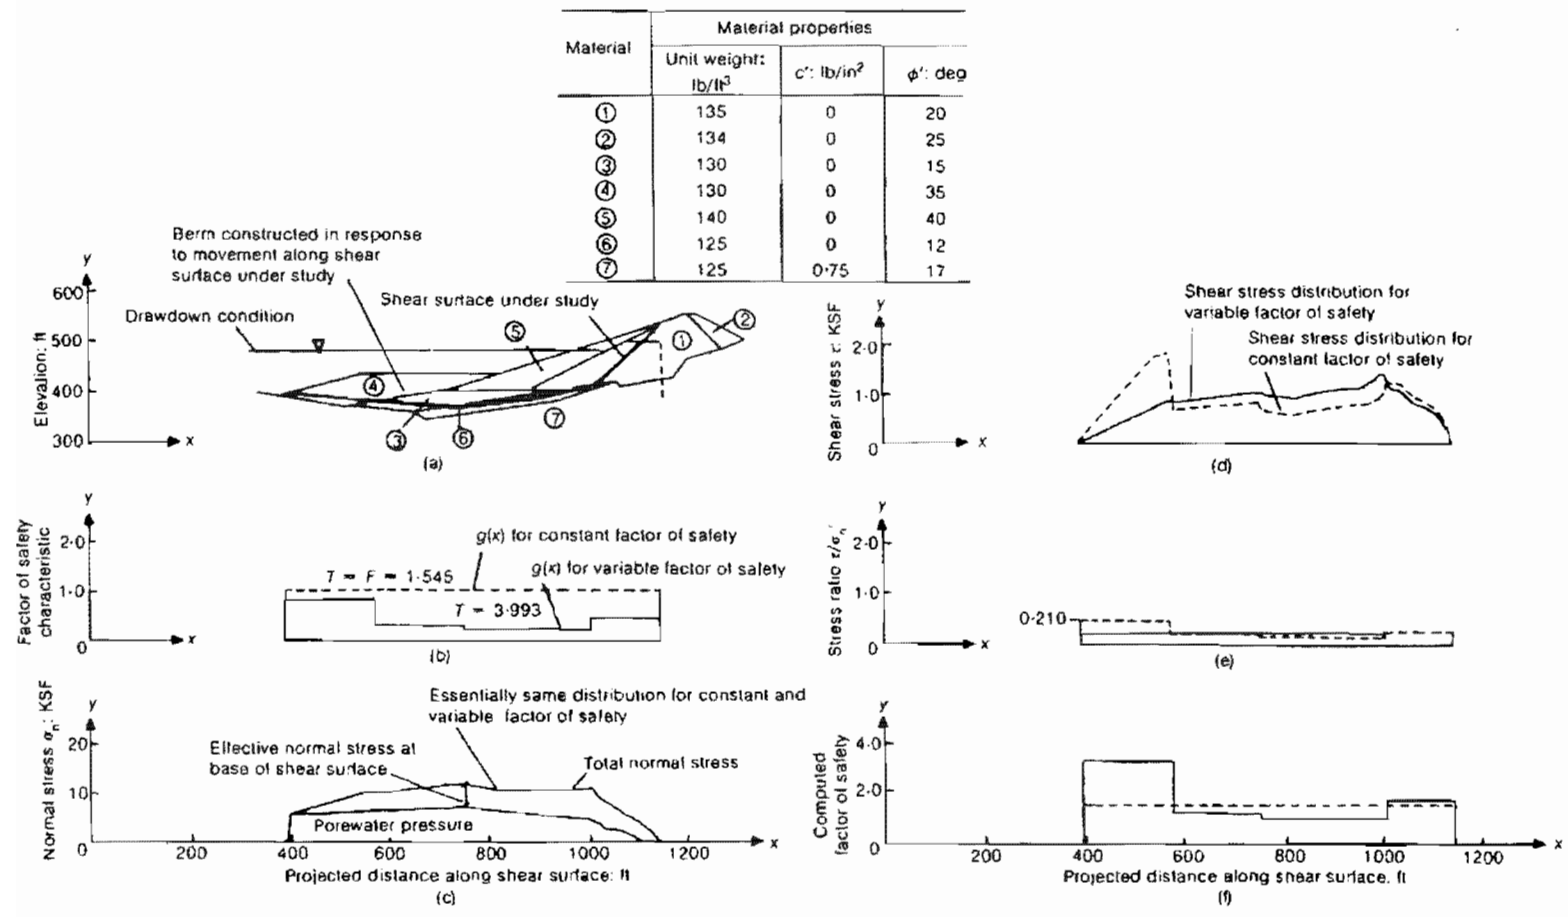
Sample problem (reservoir water elevation, 480 ft)
